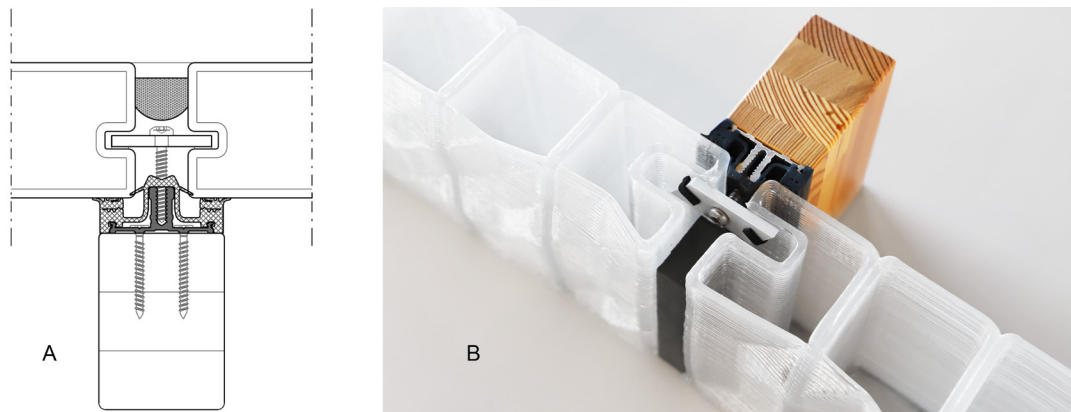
A: Panel-to-panel vertical connection detail; B: Panel-to-panel vertical connection, prototype (wet or dry sealant missing).
